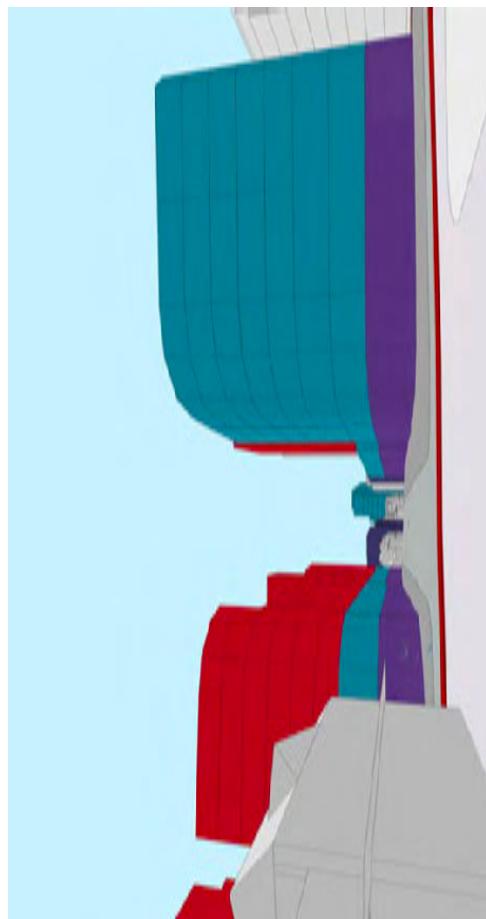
View 1 - northward, Corner McEvoy Street and Botany Road
